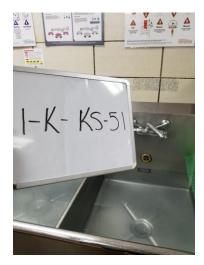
Kitchen sink, located on the 1st floor in the kitchen.
